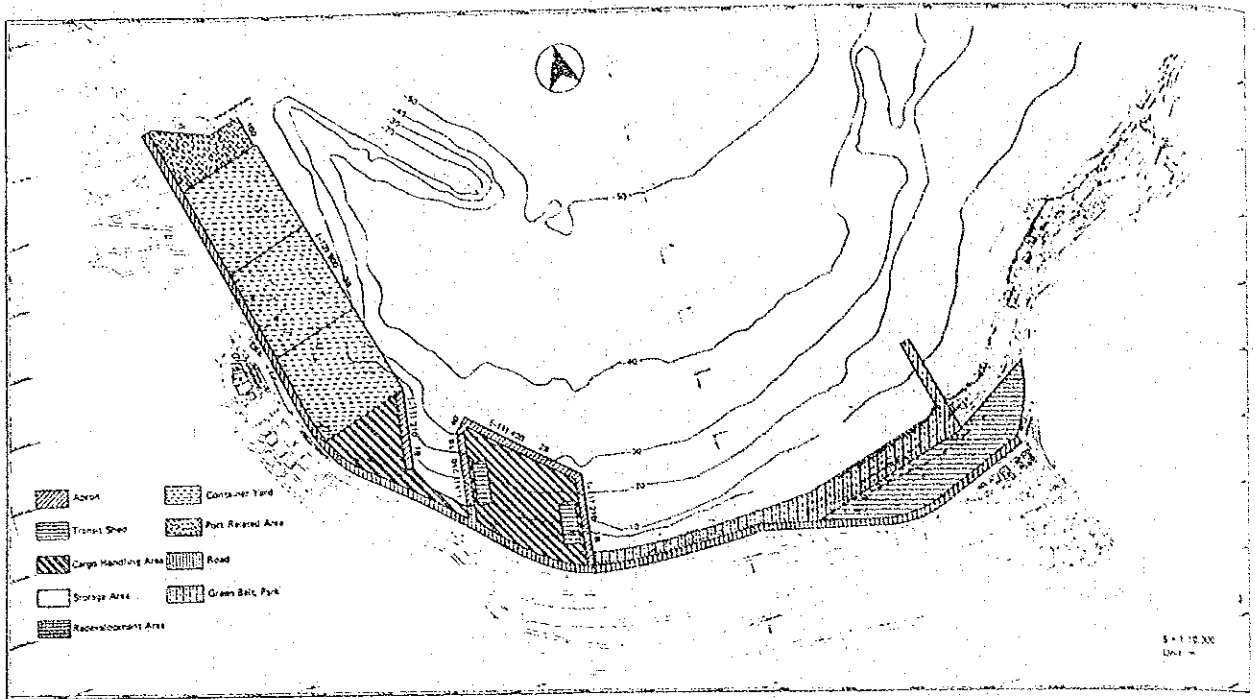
Master Plan of Valparaiso Port (2010) Plan C
